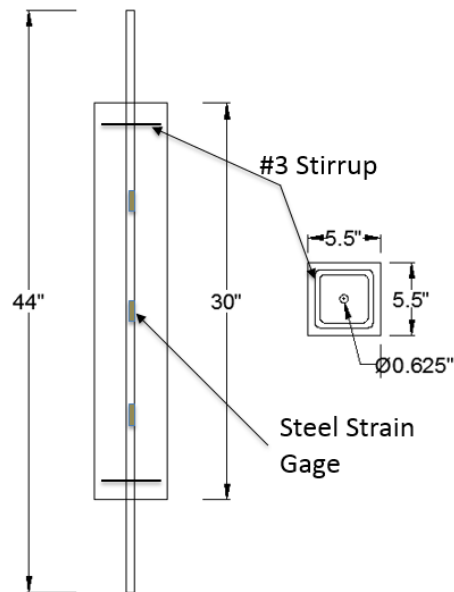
Prism Specimen with a 5.5" × 5.5" Section
